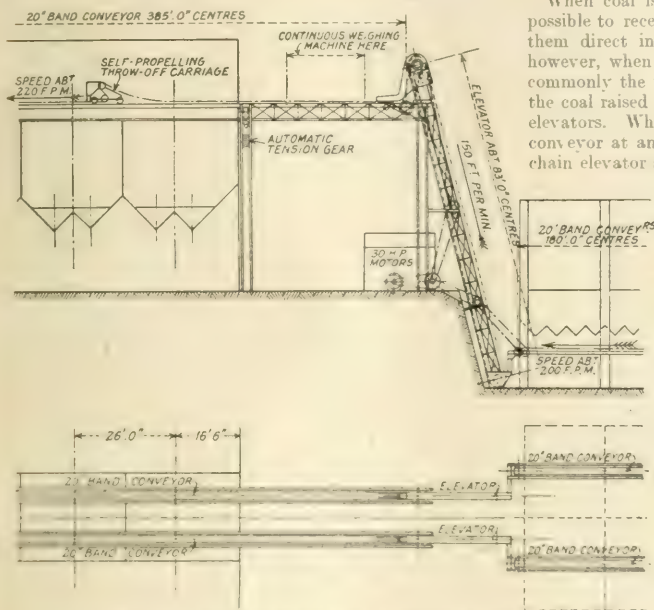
ARRANGEMENT OF COAL HANDLING PLANT.
